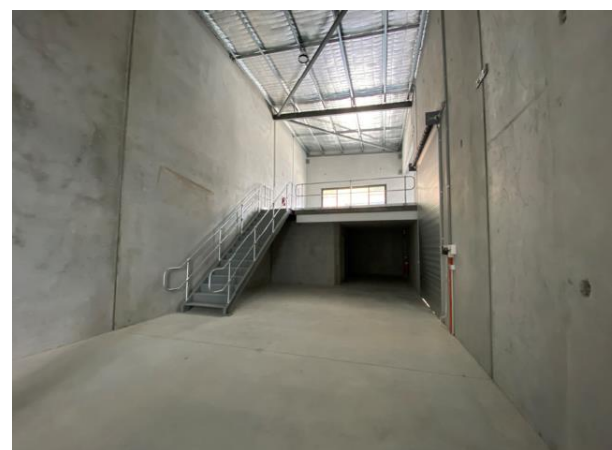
Subject site, View south inside Unit 17 showing the existing mezzanine level
